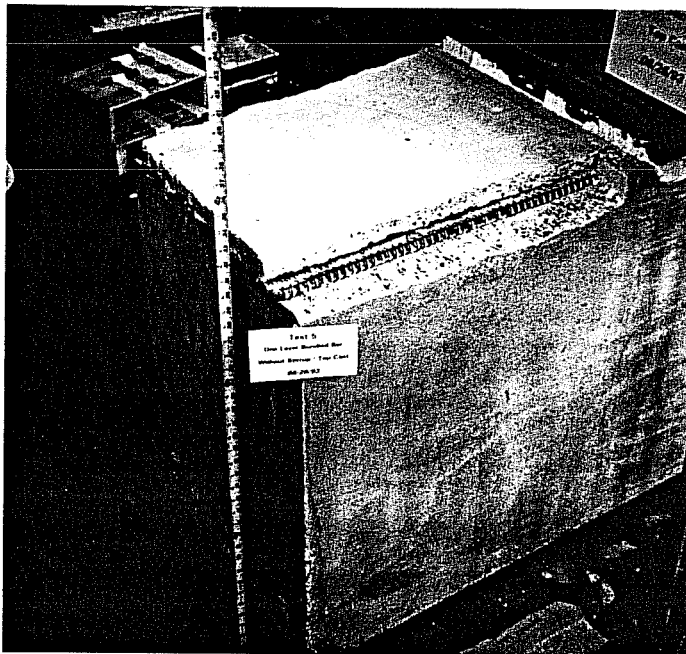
Failure mode for one layer of bundled bars without transverse reinforcement (Test 5 1-24-NS-T)
